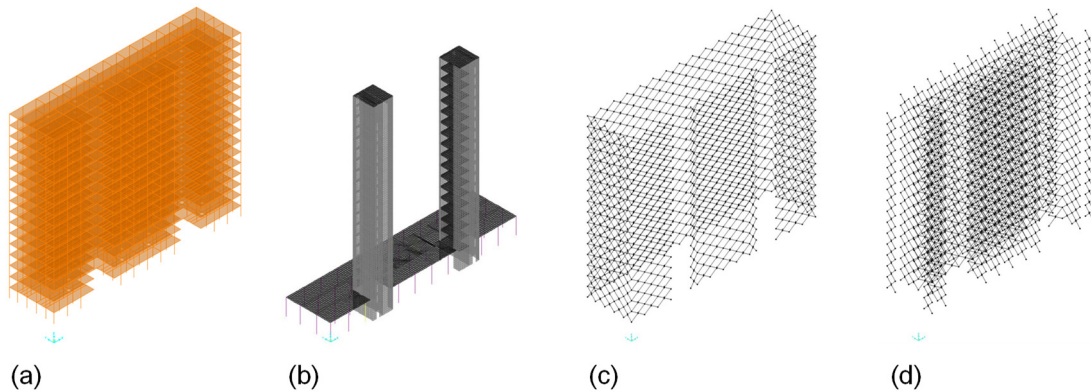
Finite-element model: (a) Timber members, (b) Reinforced Concrete elements, (c) Claddings, (d) Partition walls.
